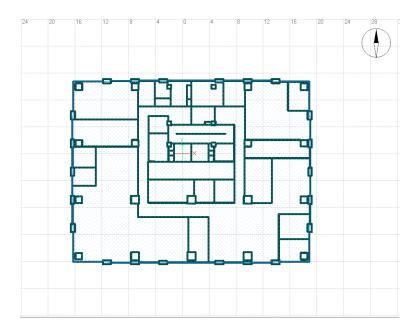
Floor Plan of ah Typical Office Building
